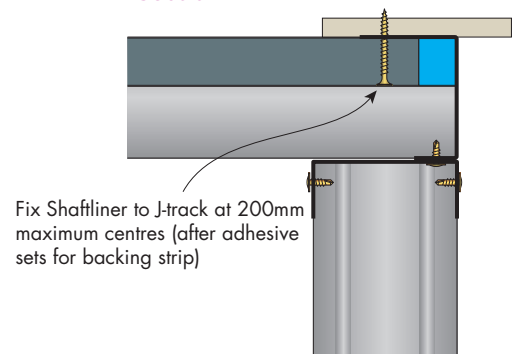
Shaft Wall Ceiling to Steel Stud Wall
